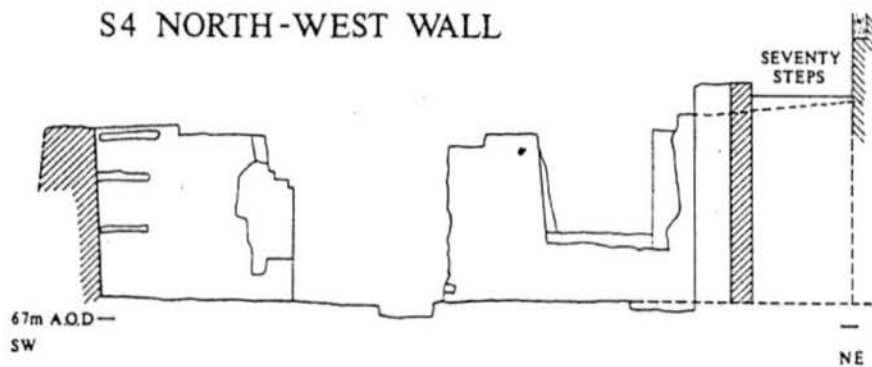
No.22 Pride Hill: Cellar wall elevations.
